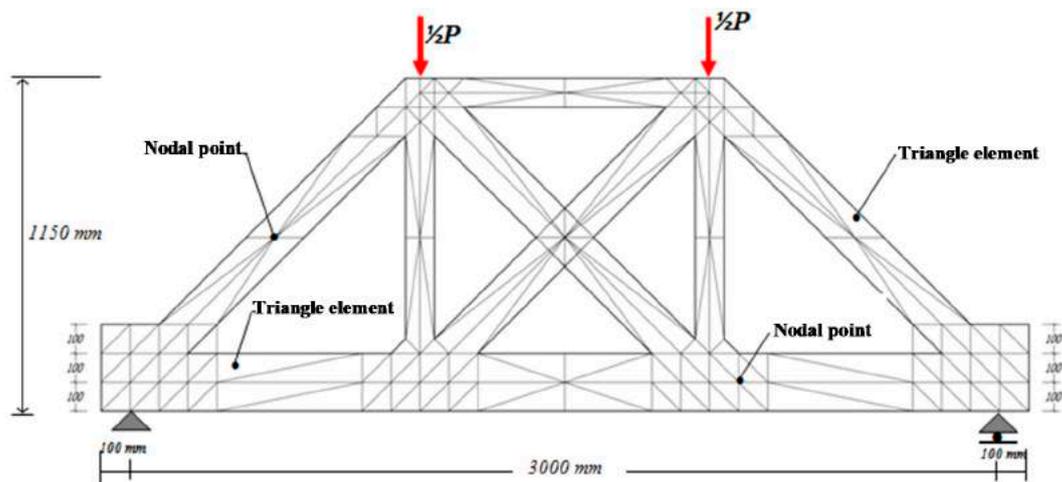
Discretization of the bamboo reinforced concrete bridge frames.
